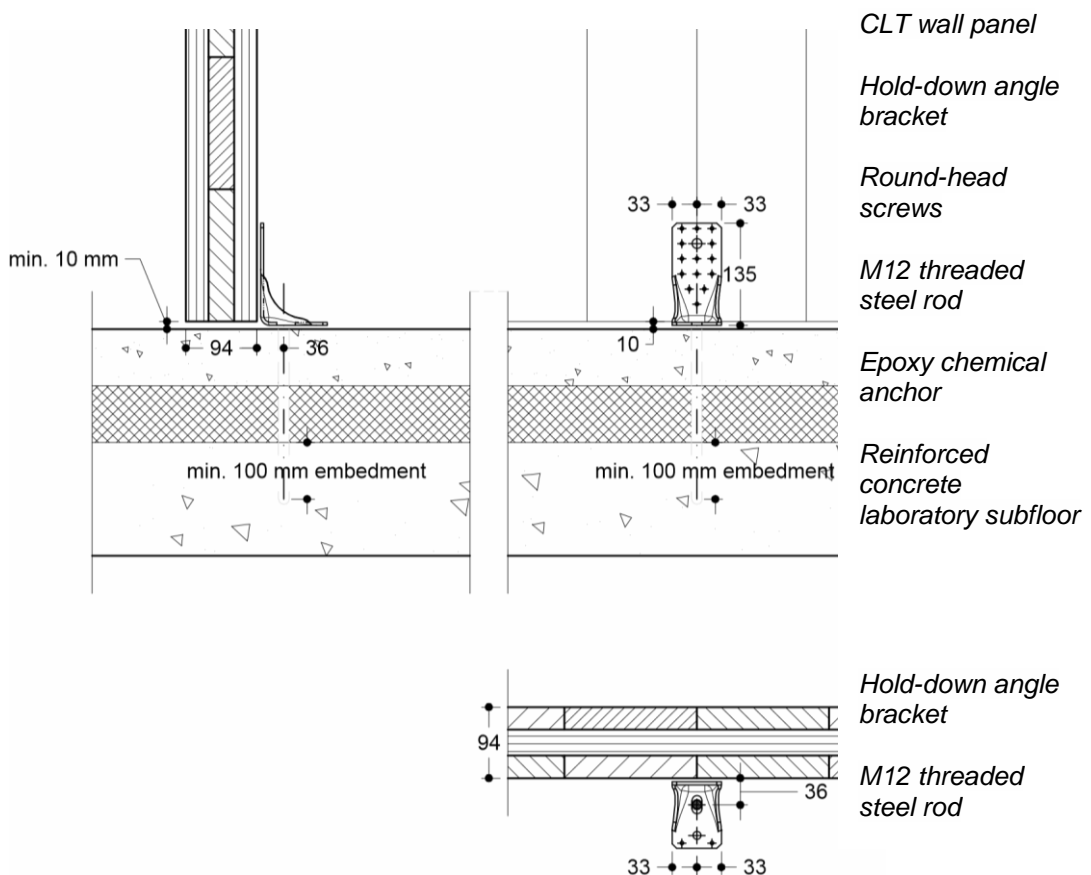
Hold-down brackets fixed to concrete laboratory floor @ 500 mm c/c with epoxy chemical anchor, min. 100 mm embedment in the structural floor slab.
